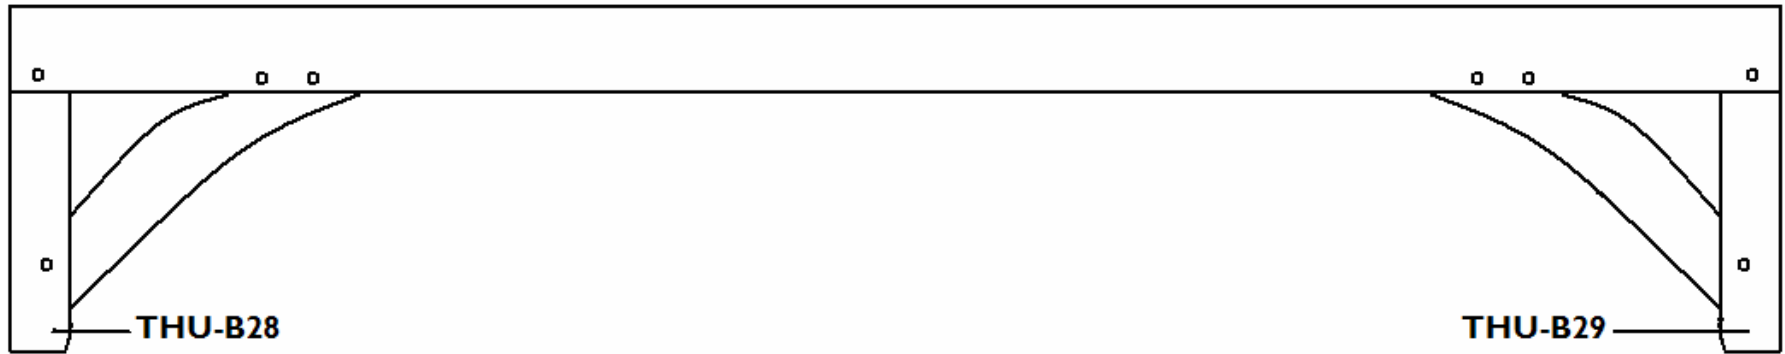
Upper in-situ timbers; sketch of south truss, showing the location of samples THU-B28 and THU-B29
